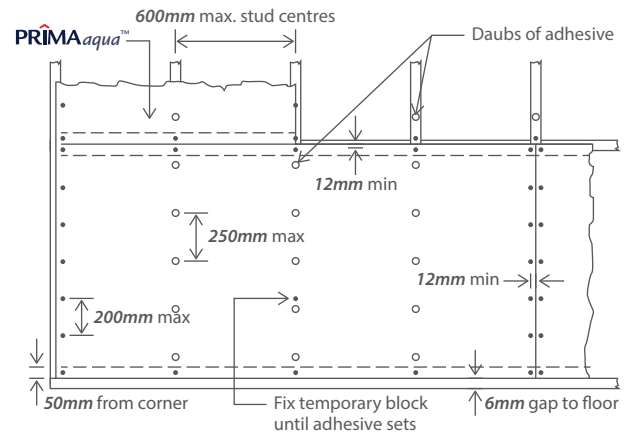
Adhesive and Fastener Fixing (Untiled Wall)
